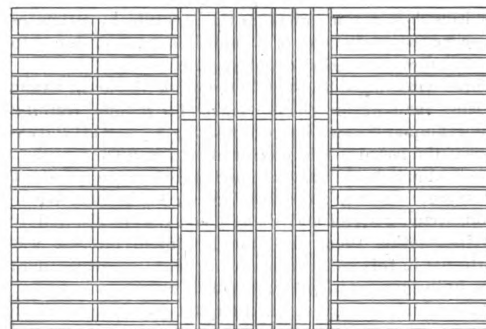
Method of Drawing Floor Framing Plan.—Scale, 1-16 Inch to the Foot.
